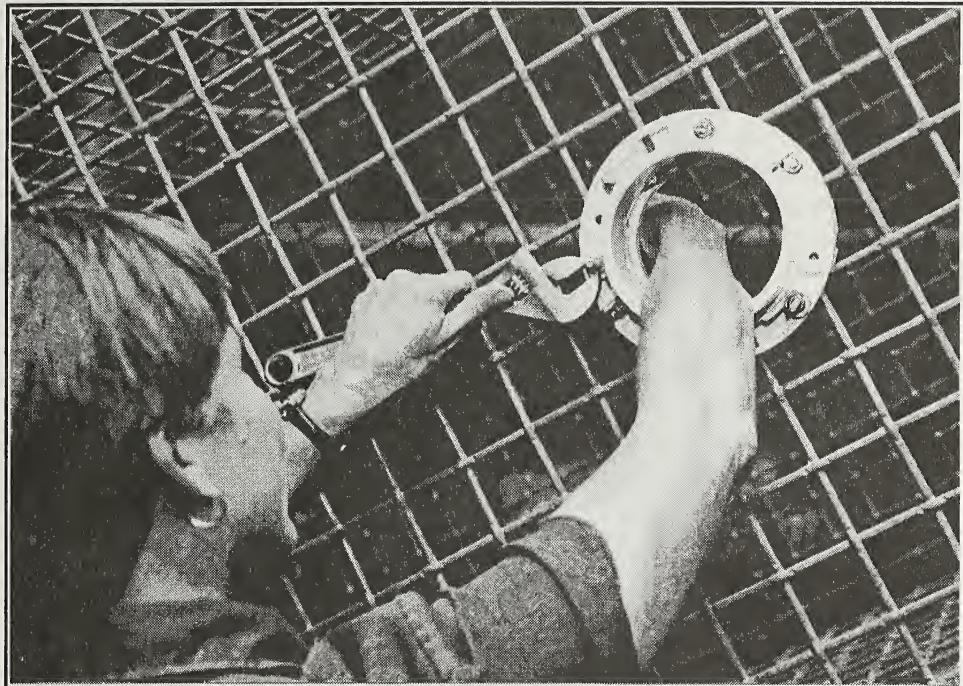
Second PVC flange placed on outside of caging and secured to first with six bolts, nuts and washers. (Photo by Cathy Burkey)
